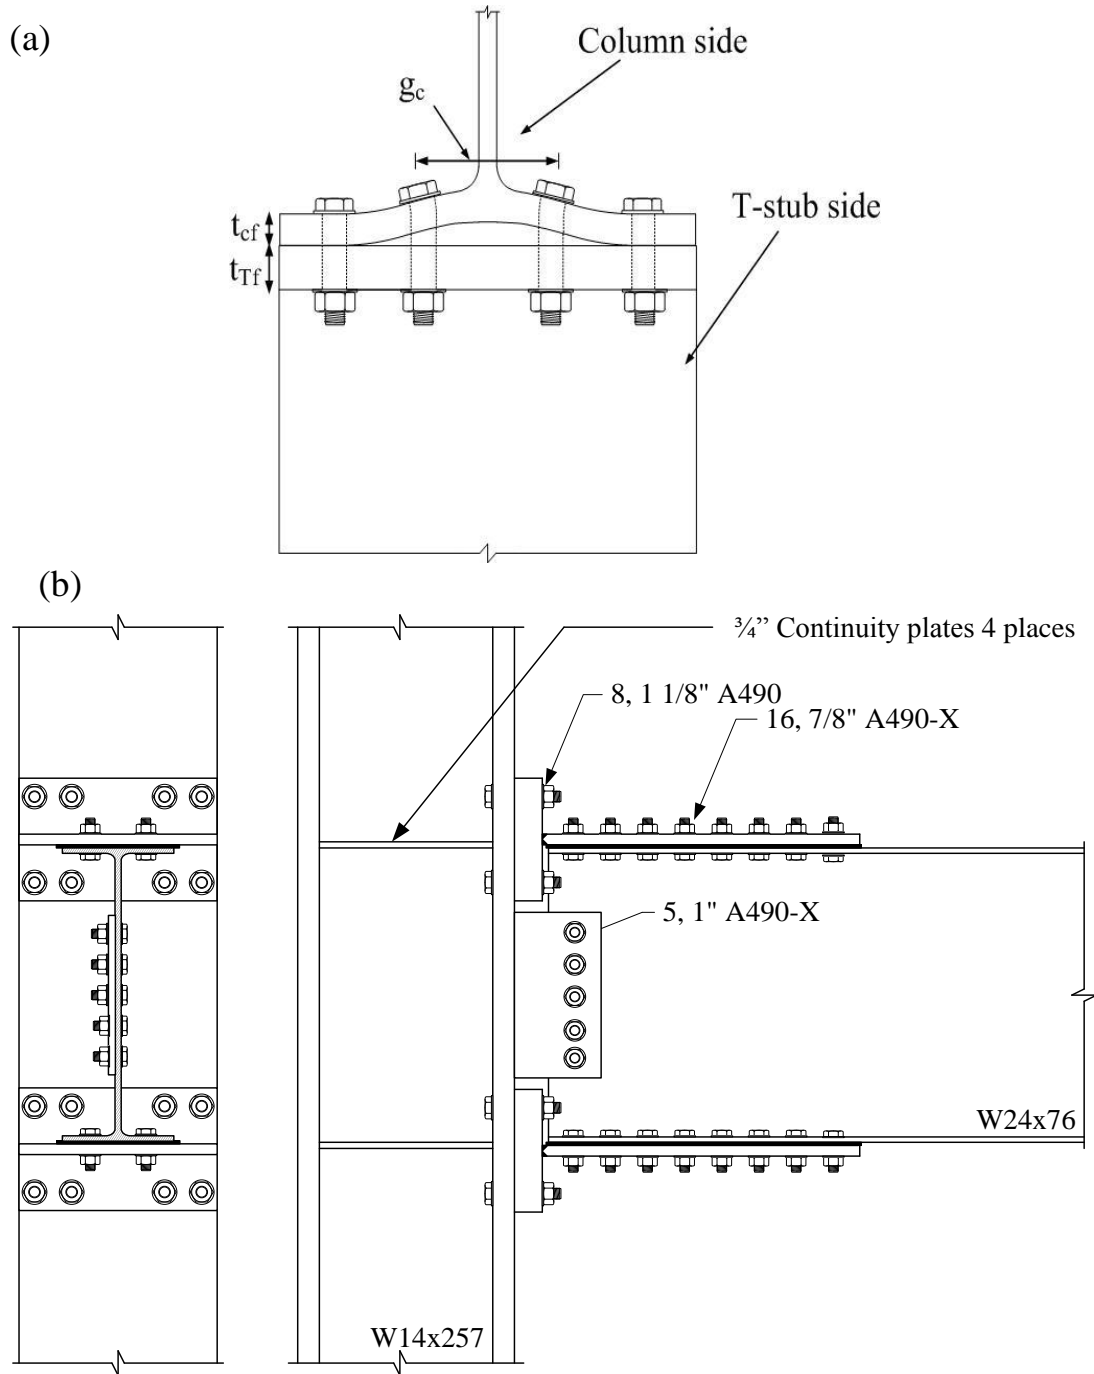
(a) Top view of the T-stub/column flange system, (b) Design sketch for a typical built-up T-stub connection associated with W24x76 beam.
